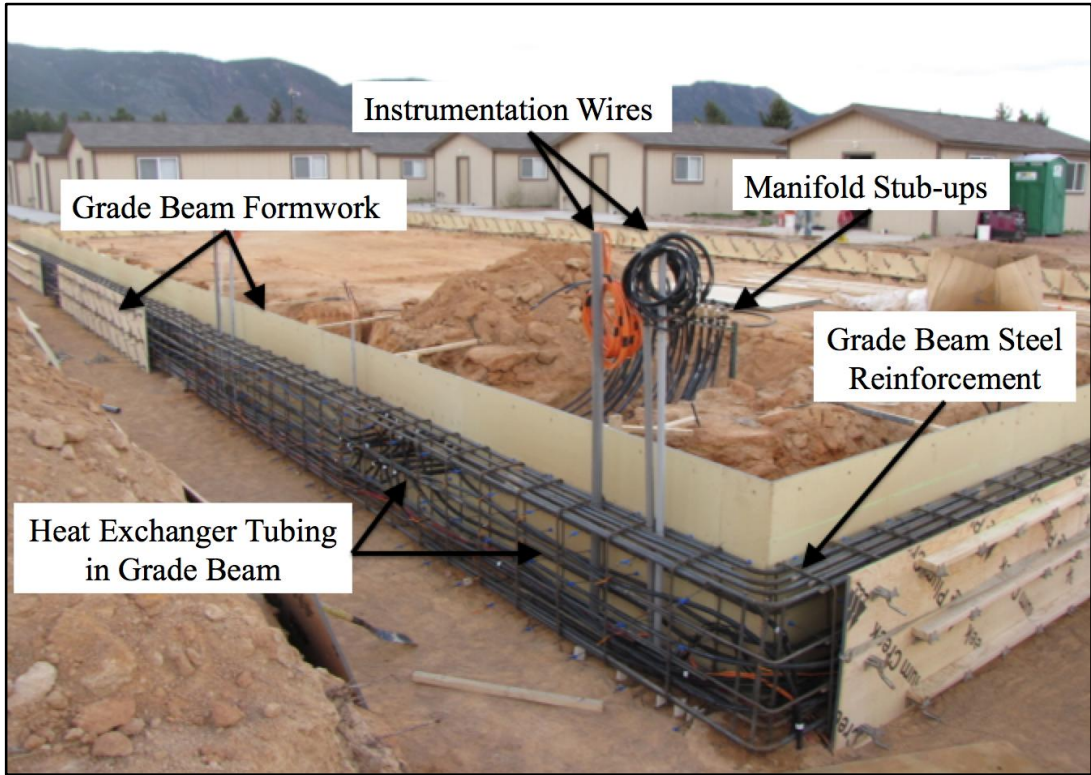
Runout tubing in grade beam prior to concrete placement
